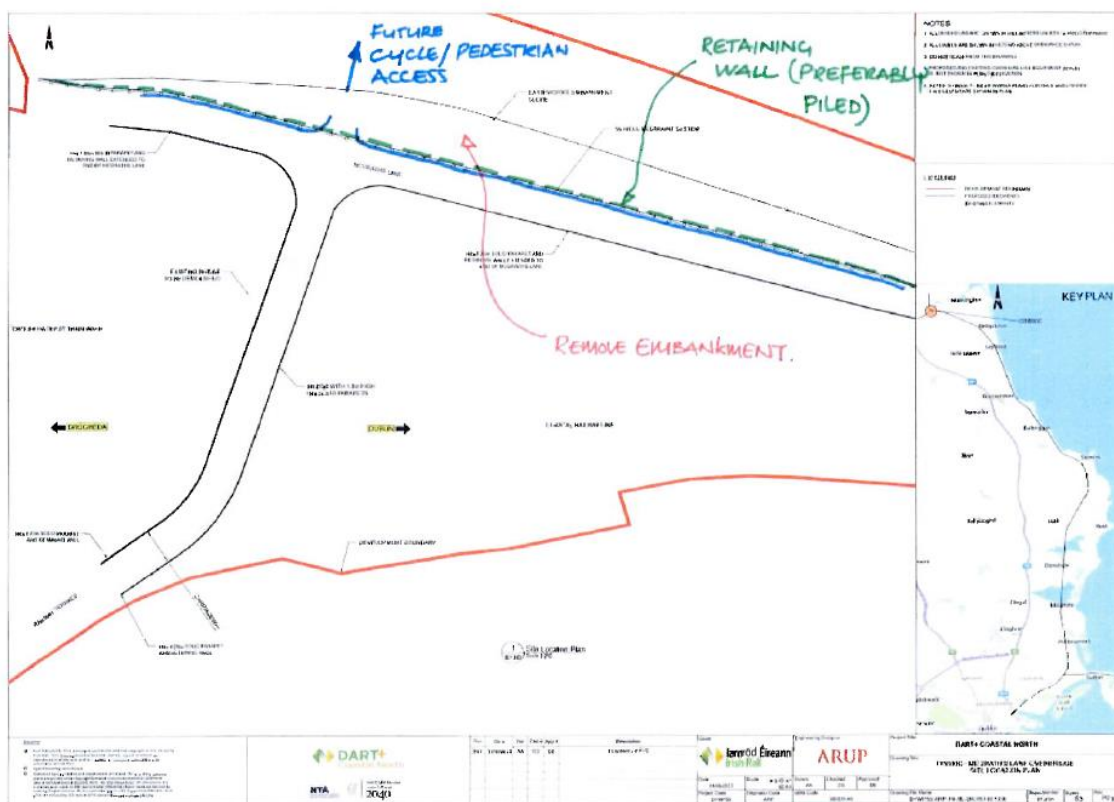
Alternative Bridge Reconstruction Proposal from Submission SB0134
